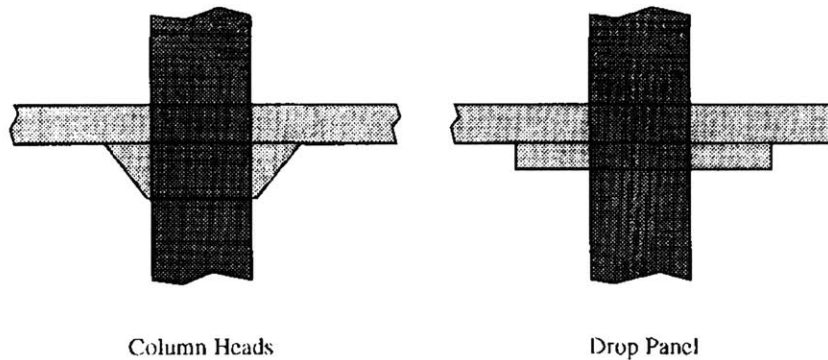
Punching-Shear Prevention Details Near Columns (Ettouney et al)
